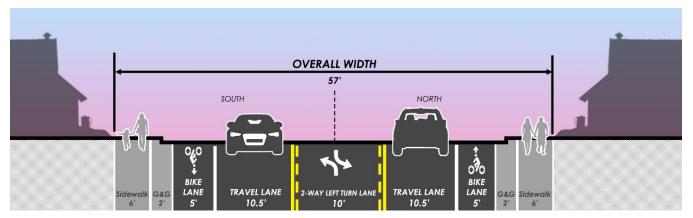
provides an example of the approximate sidewalk location if sidewalks were built outside the roadway footprint. Note that the City's right-of-way extends further into existing yards than the six feet required for sidewalk construction.
